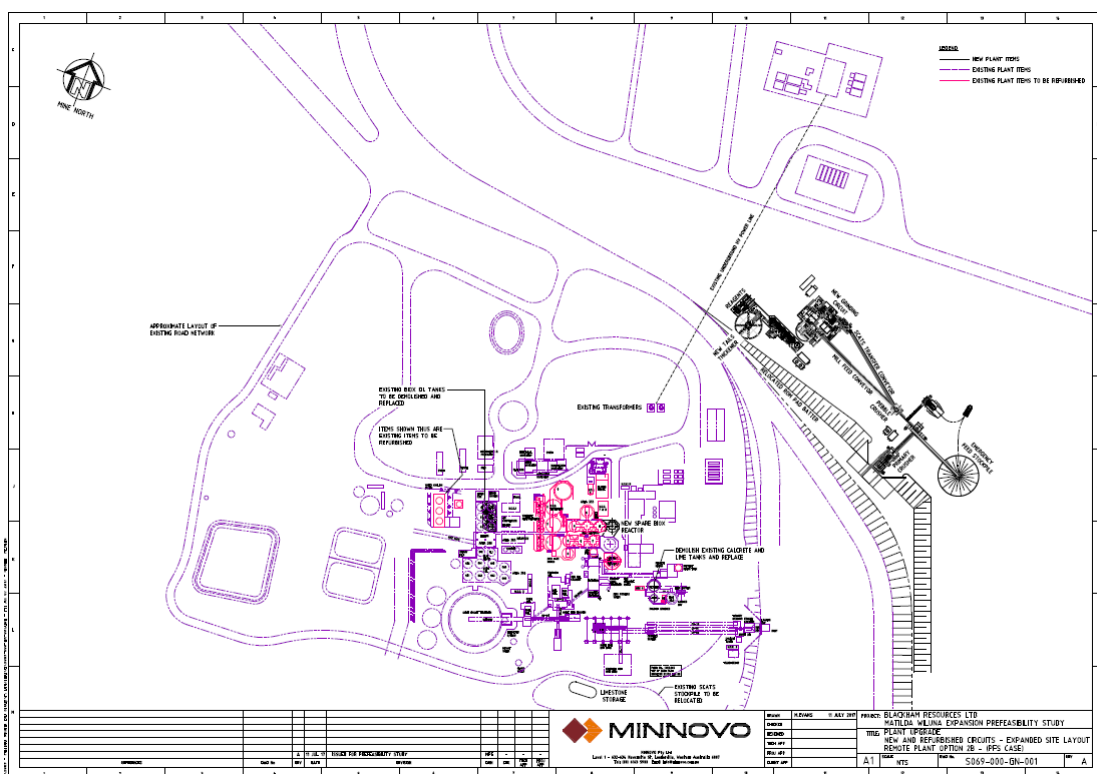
Expansion plant Layout with existing plant and infrastructure in purple, new plant items in black and refurbished plant in red
